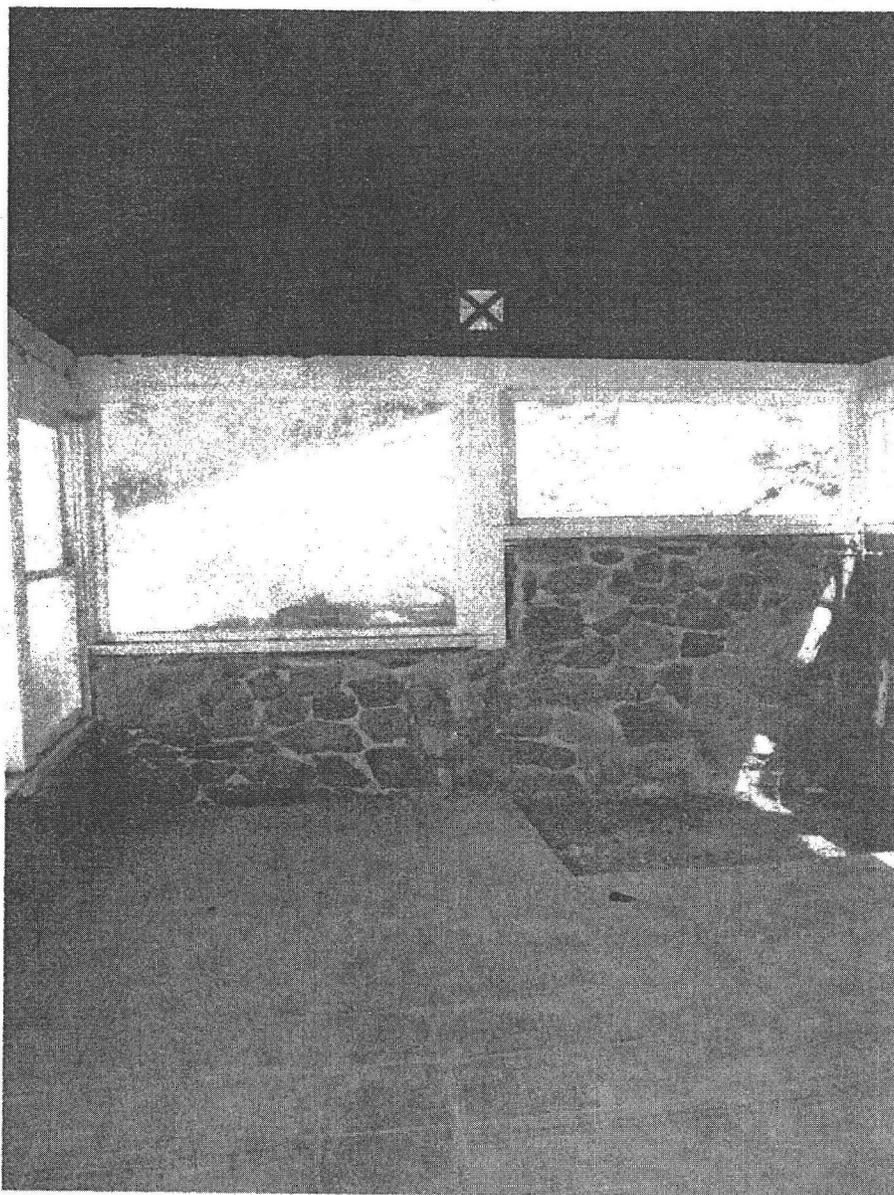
(above): View of the interior of the cabana looking north at the north elevation. View shows vaulted ceiling, rubble stone foundation constructed into the hillside, wood framed windows and red stained and scored concrete flooring. Note: This concrete flooring is the same period and design as early paving that was discovered under an early addition of the main residence.
